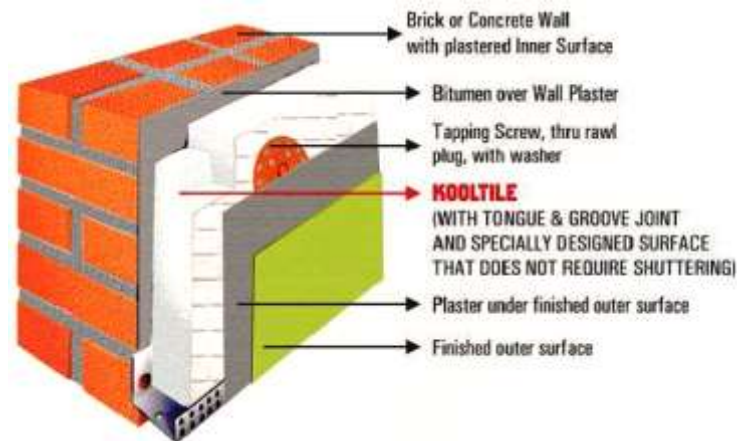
Section showing the procedure of installing insulated EPS tiles on the wall surface
